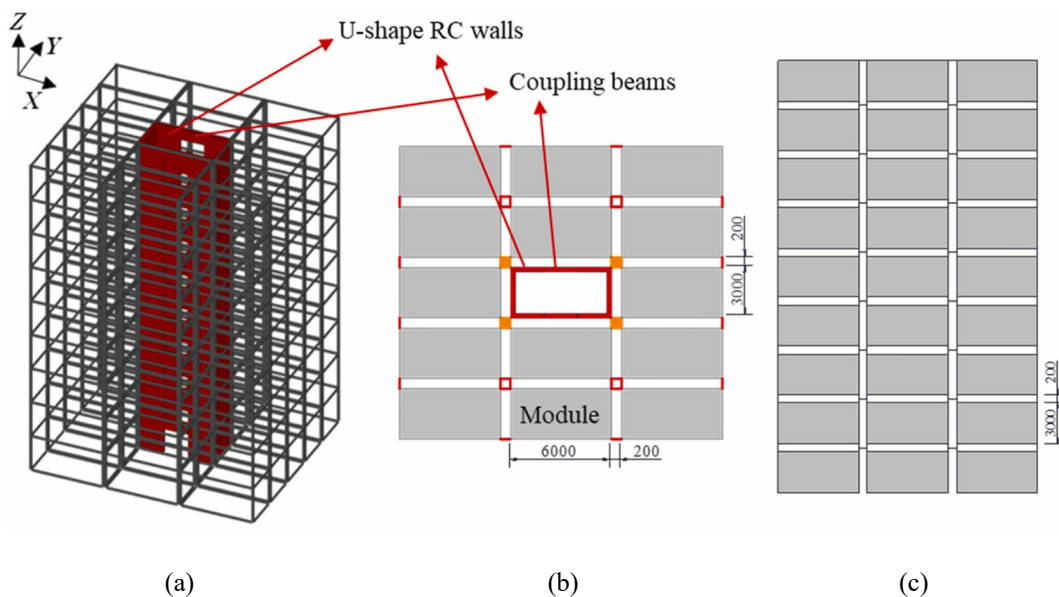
Prototype 9-storey modular building: (a) 3D view, (b) Plan view, (c) Elevation view (Units: mm)
